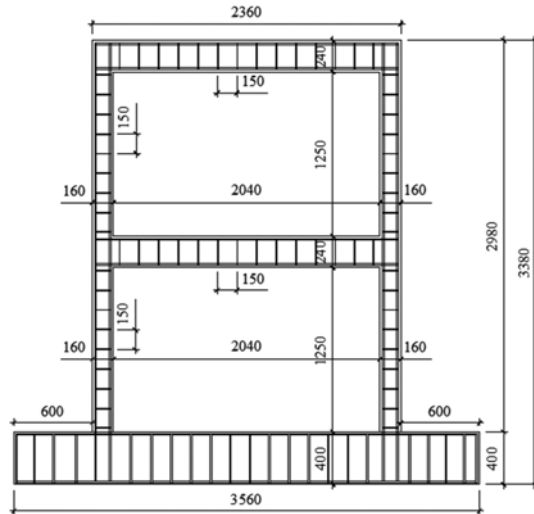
The Dimension and Reinforcement Scheme of Test Frames (Dimensions are in mm)
